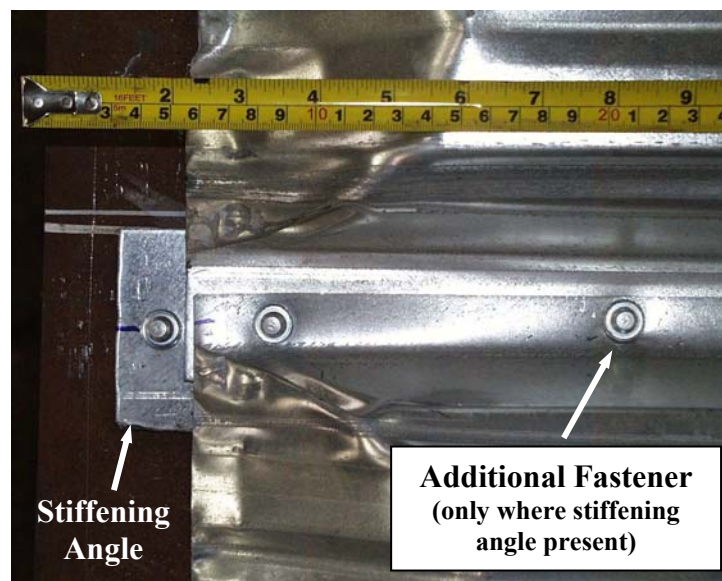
END FASTENER DETAIL AT STIFFENING ANGLE
